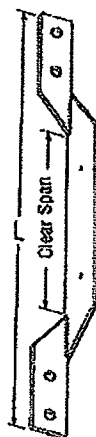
FTA FLOOR TIE ANCHOR (See Table 6)
